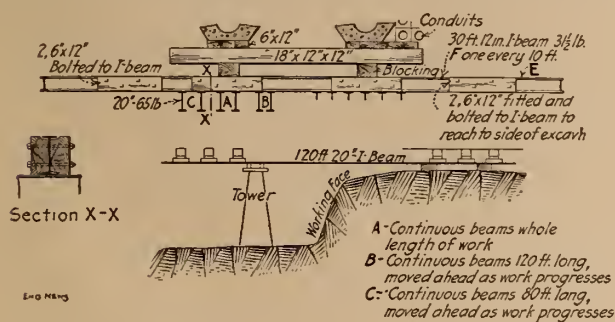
SKETCH SHOWING STEEL BEAM SUPPORTS FOR TRACKS OVER ROCK EXCAVATION, LEXINGTON AVE., SECTION 13.
